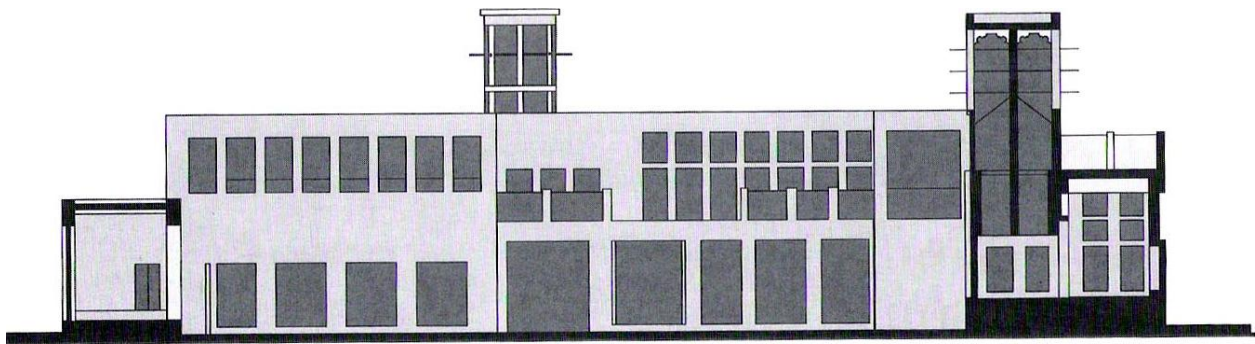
Figure B: A cross section through the wind-tower that was used as a passive cooling system for indoor spaces
